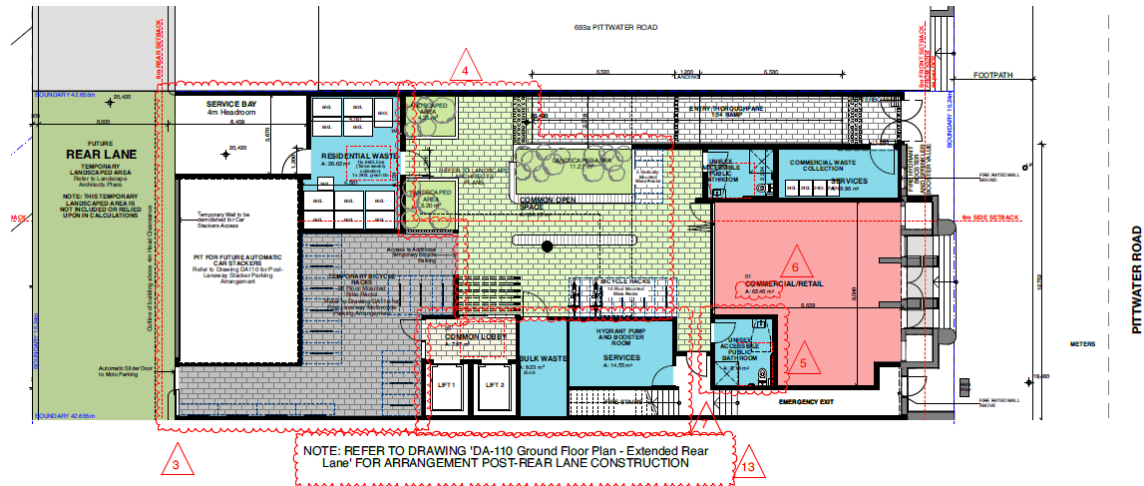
Revision C Ground Floor plan – Interim (DA 100)
